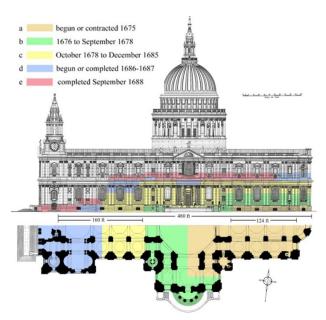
St Paul's Cathedral: Elevation and half-plan showing phases of construction from 1675-1688.
